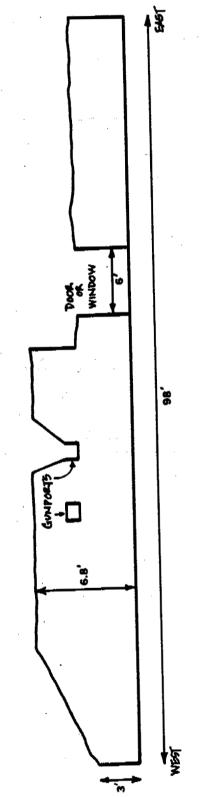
Elevation of North Outside Wall at Sand Springs Station
